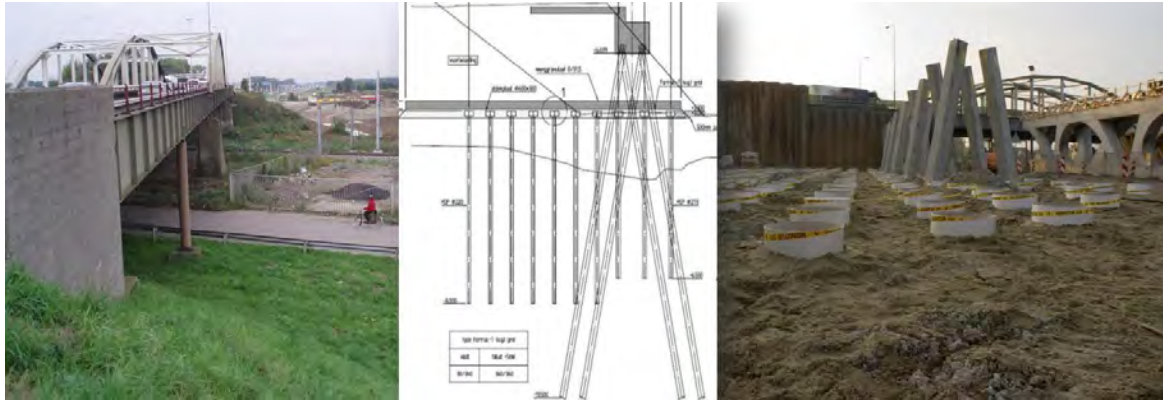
Existing bridge (old situation, left), LTP, sheet pile and abutment foundation (right)
